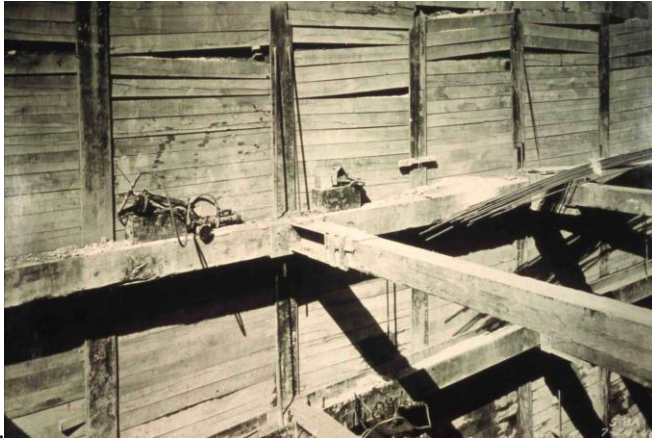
In 1940 Peck began measuring loads on timber struts of the braced excavations using hydraulic jacks, as shown here (Peck Collection-NGI).
